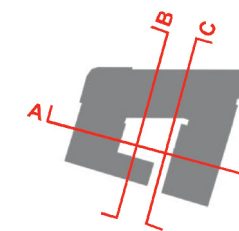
Block 1 Sections (not to scale)(Leach Rhodes Walker, drg no. 7884-L(00)291A, scale 1:200 @ A1, 21/10/19)
